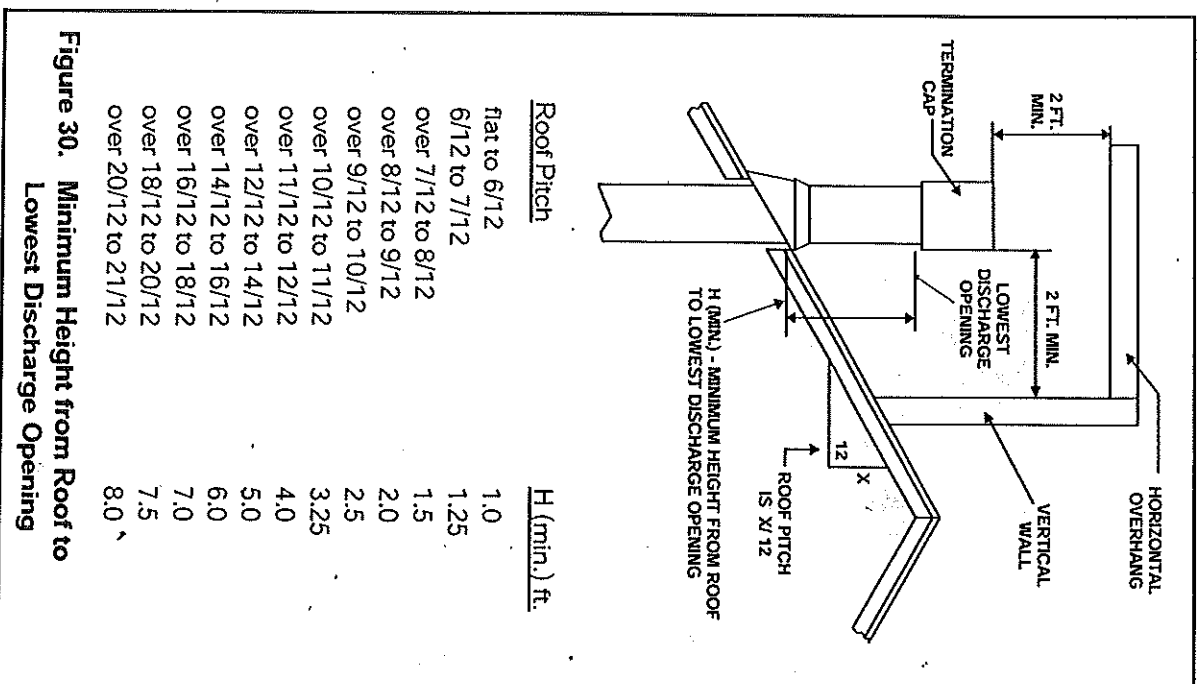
Minimum Height from Roof to Lowest Discharge Opening
